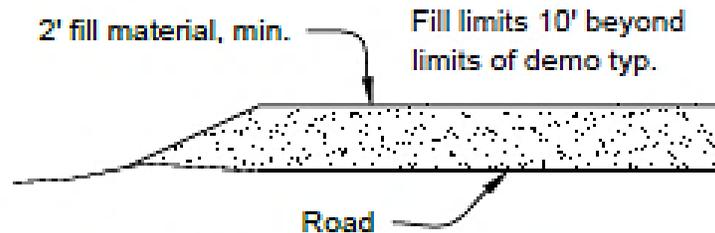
Typical Roadway Protective Cover Detail with 2-foot Fill Option
